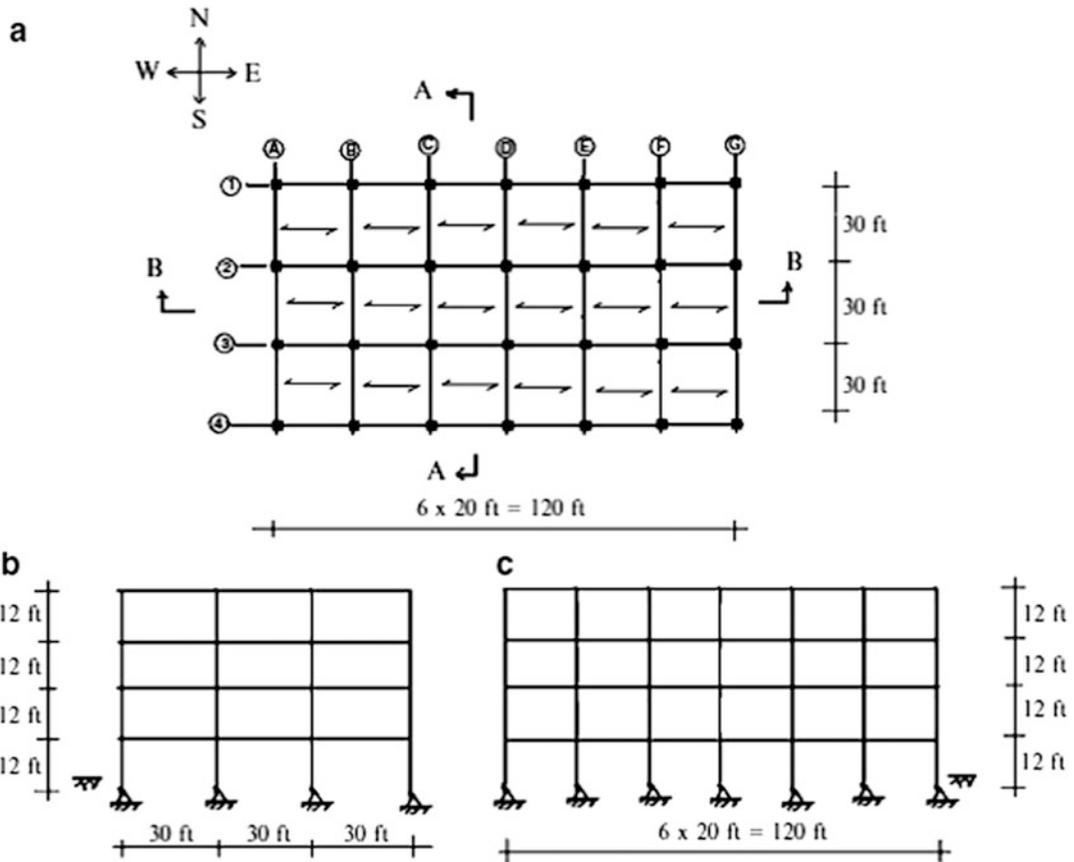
Floor plan and elevation views—case study. (a) Plan. (b) N–S elevation—Section A-A. (c) E–W elevation—Section B-B
